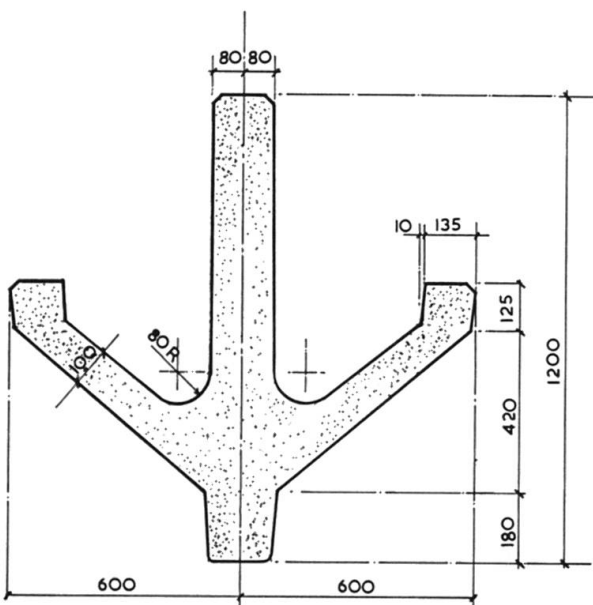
(c) Typical Section Through Pretensioned Roof Unit
